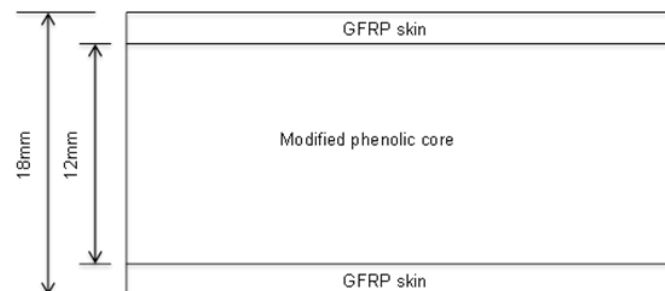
Cross-section of the single layer new GFRP composite sandwich panel
